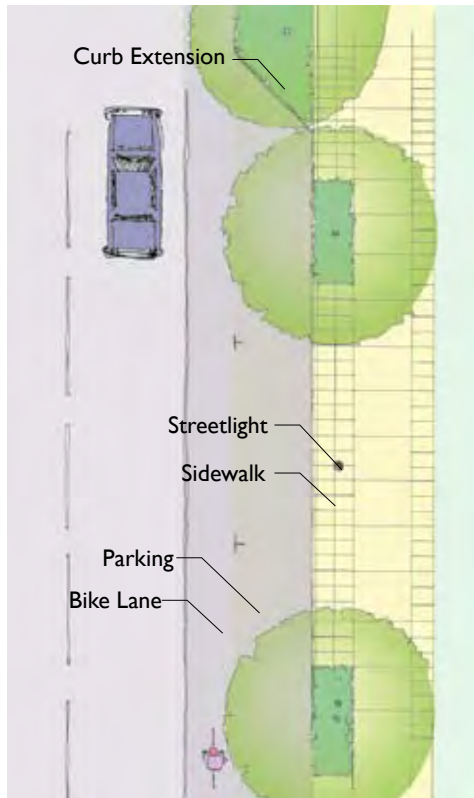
Enlarged Plan with Street Elements: Bike Lane, Parking, and Sidewalk
